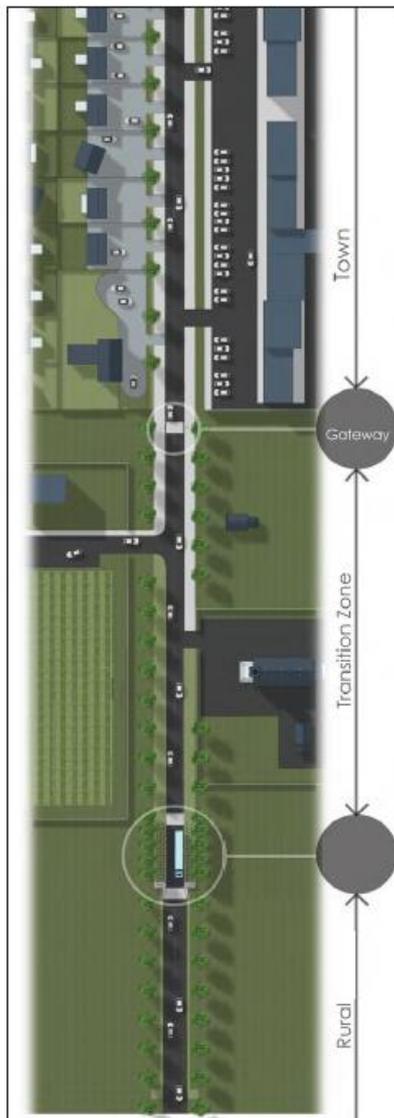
Illustration of a typical inner and outer Gateways, and Transition Zone from a rural road to a town/village.
